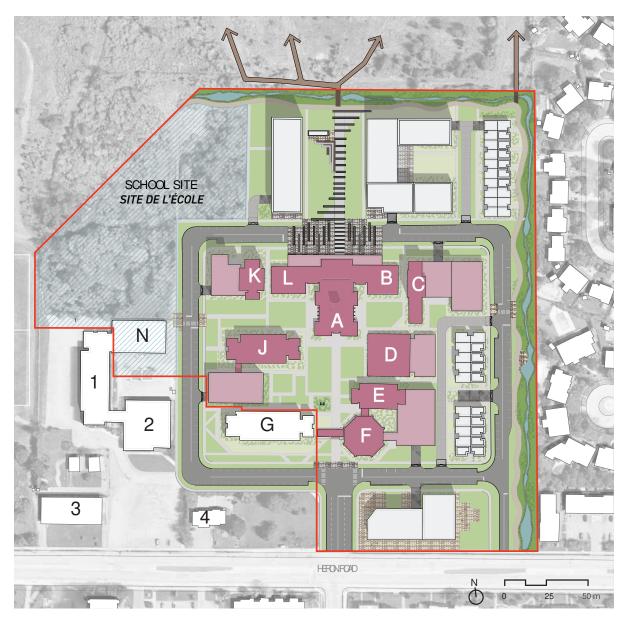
Plan showing proposed conservation of buildings and new additions (Stantec, 2022).
